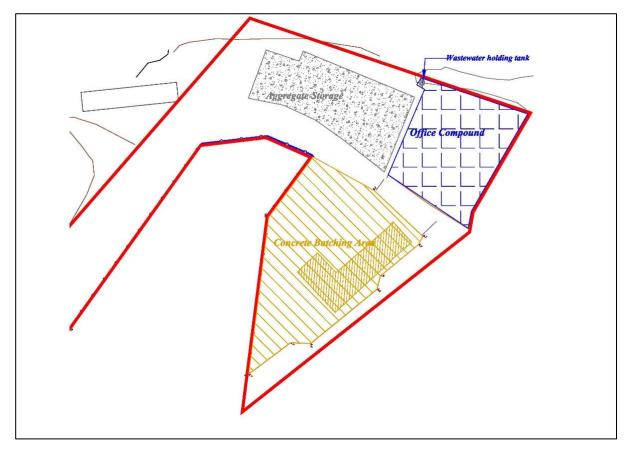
Layout for the Construction Compound Facilities at the northern end of the proposed development site.
